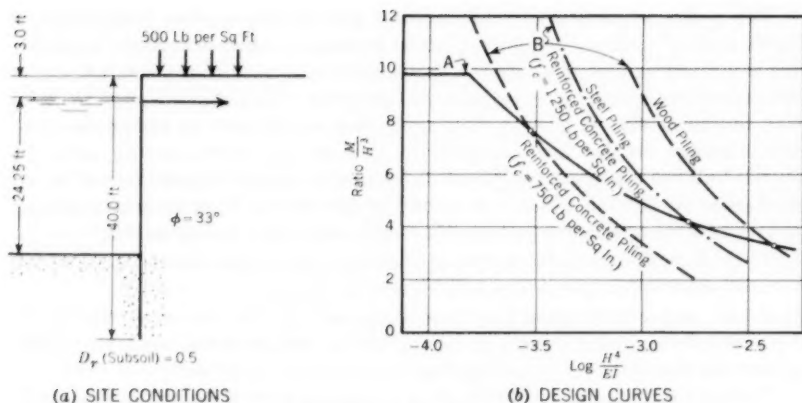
THE EFFECT OF MATERIAL OF CONSTRUCTION ON THE DESIGN OF A WALL
